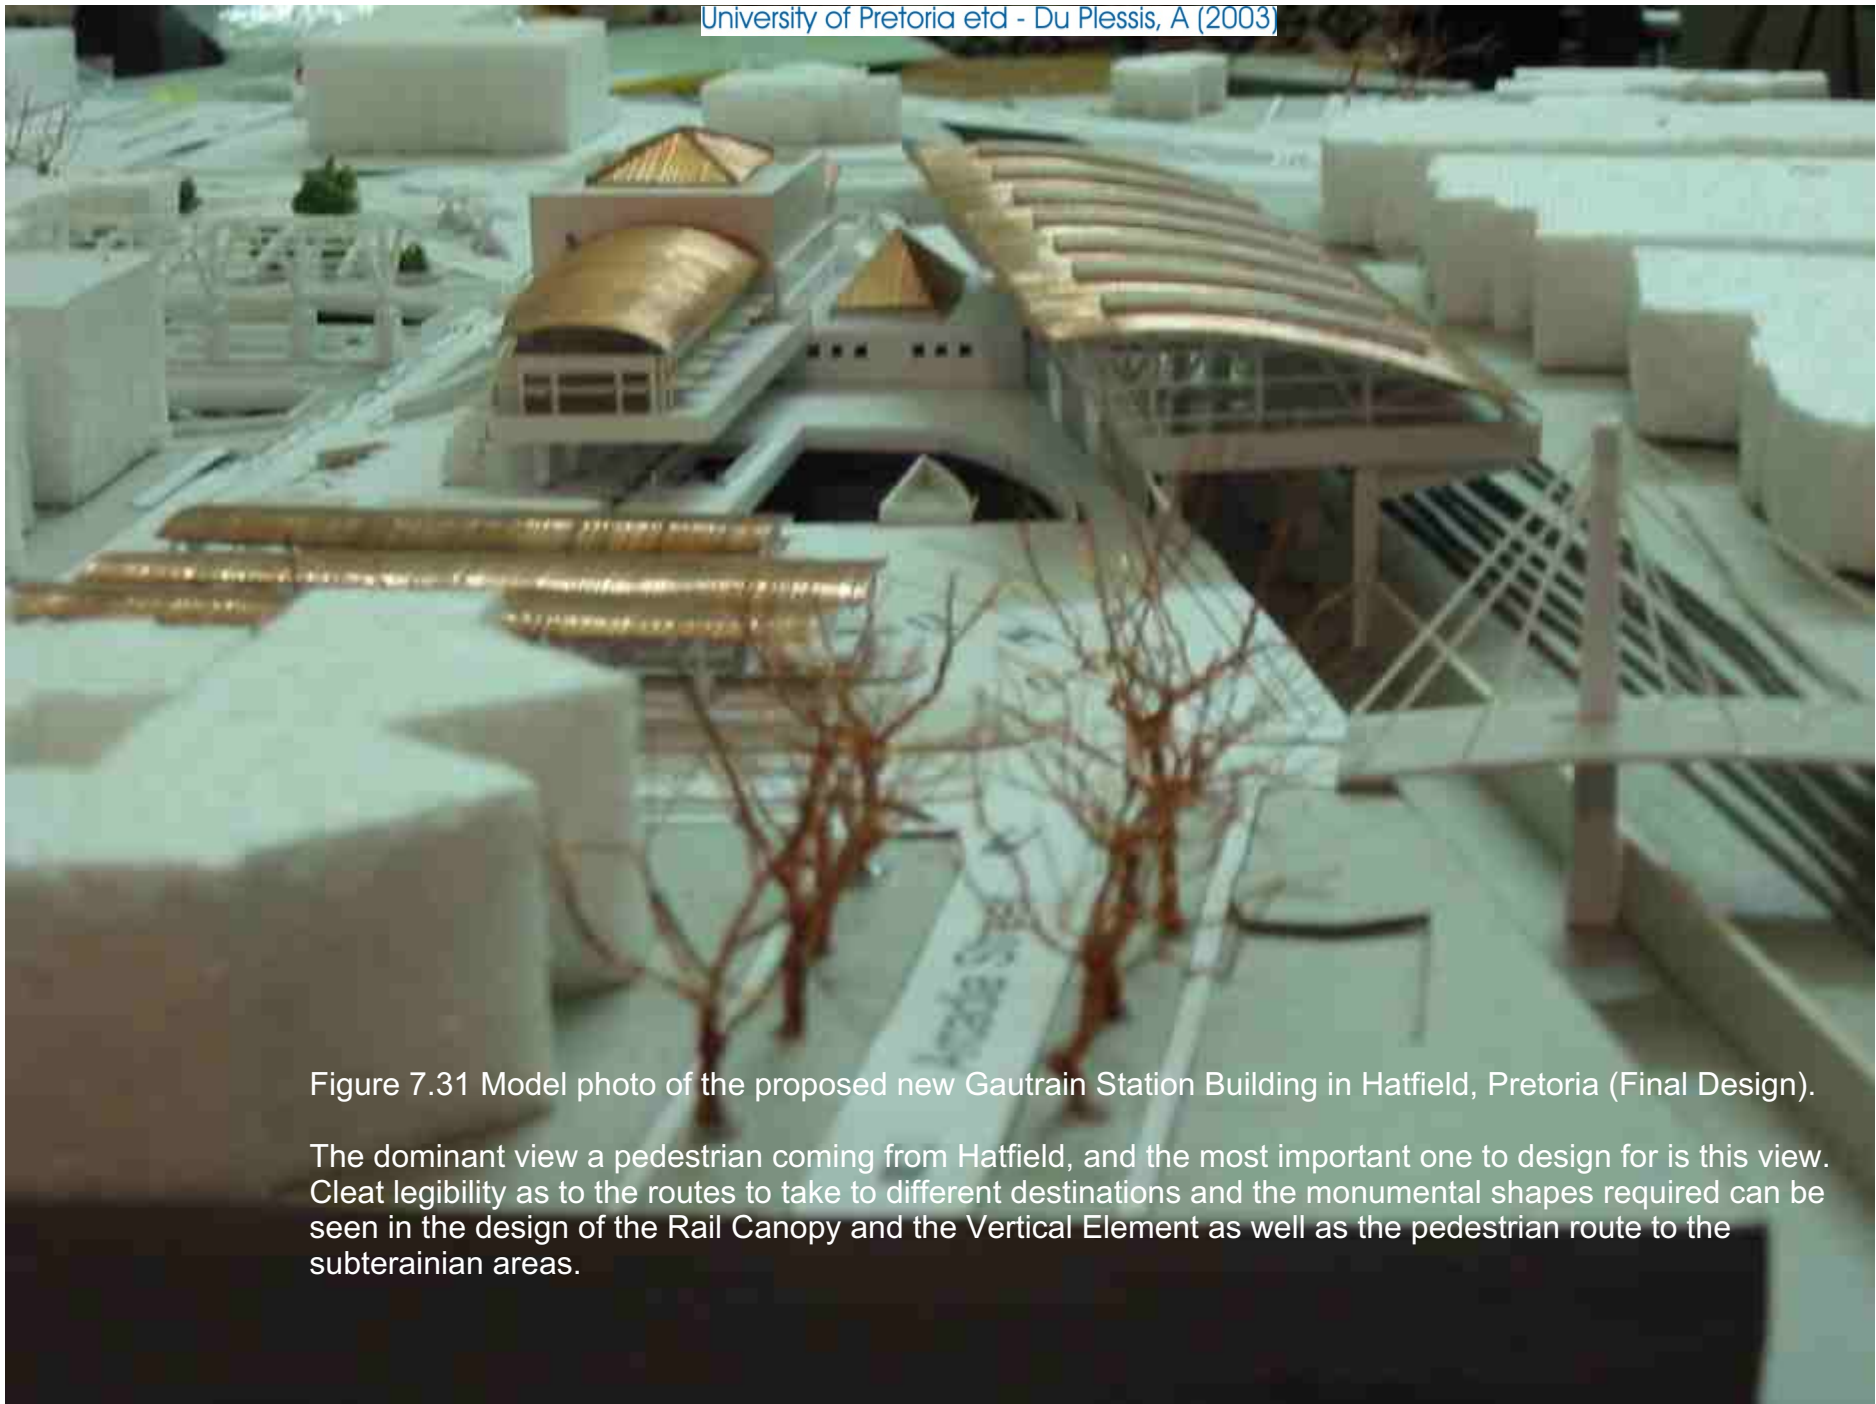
Model photo of the proposed new Gautrain Station Building in Hatfield, Pretoria (Final Design).
